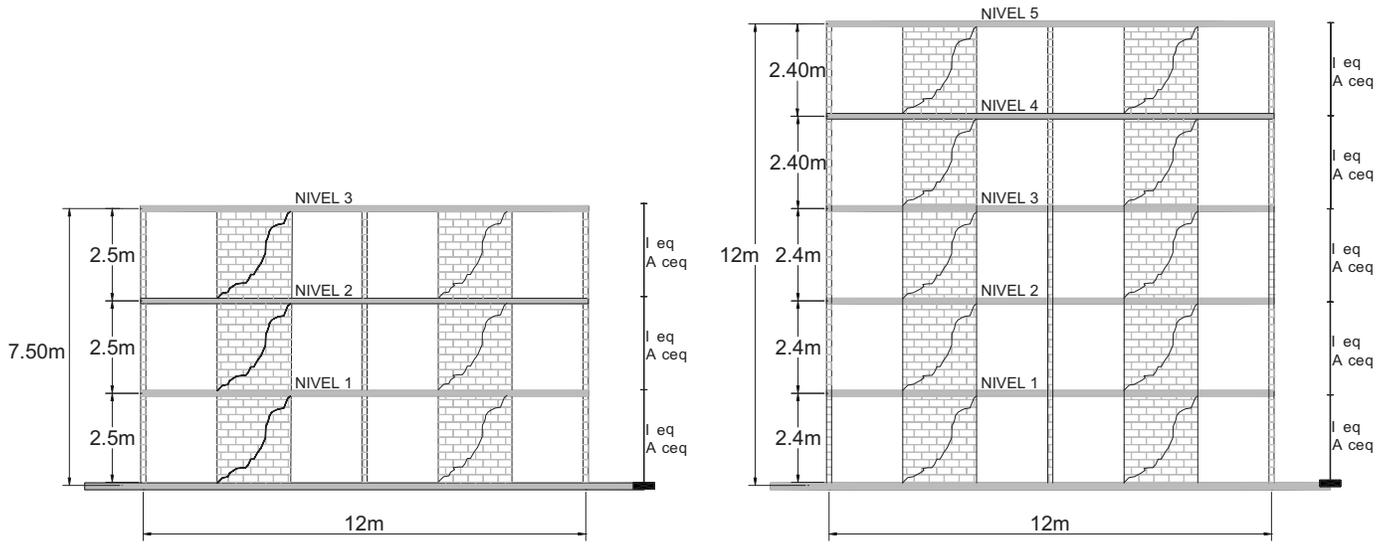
Elevation of walls running in the horizontal direction for total cracked response
